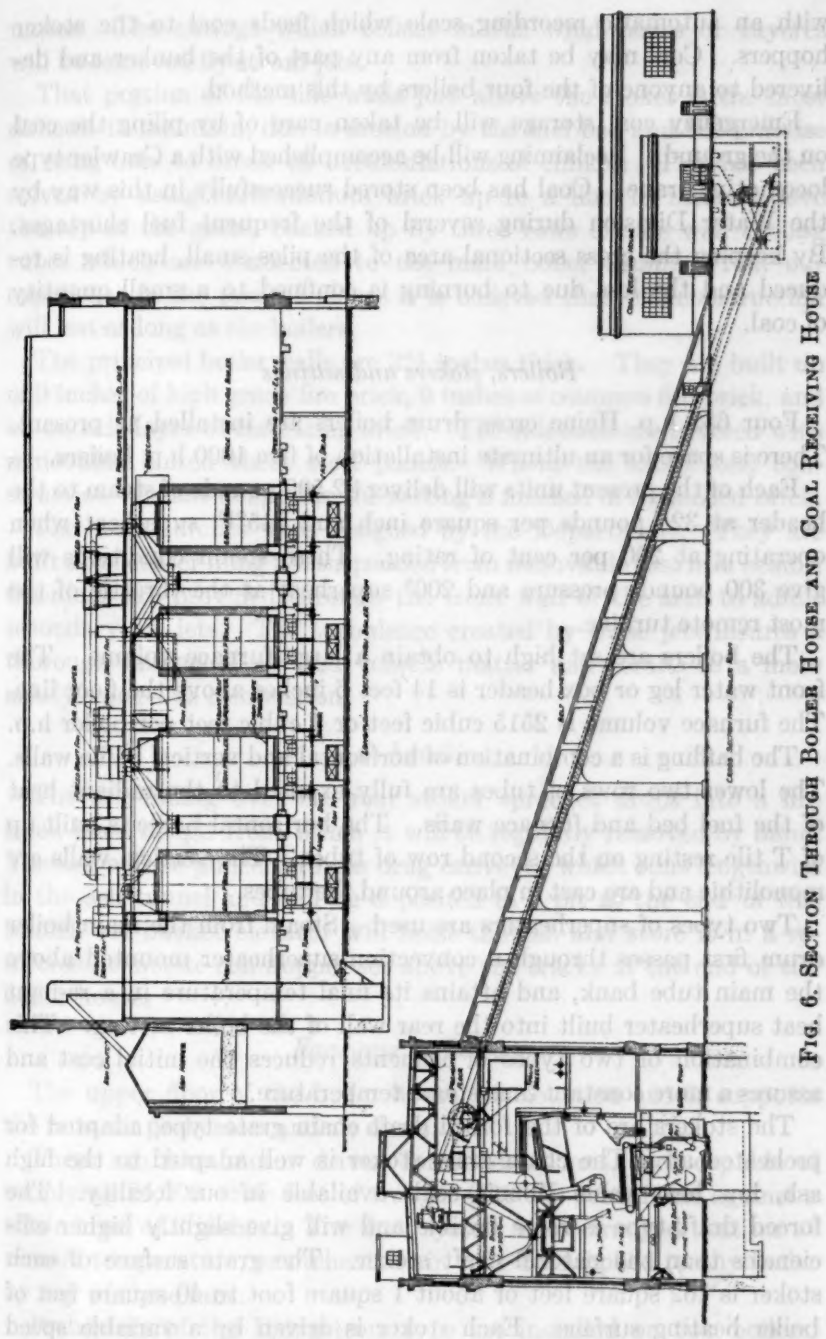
SECTION THROUGH BOILER HOUSE AND COAL RECEIVING HOUSE
